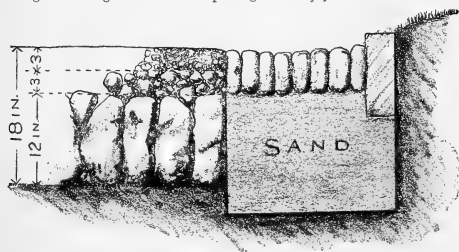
CONSTRUCTION OF GUTTER, COPING AND PAVEMENT.
